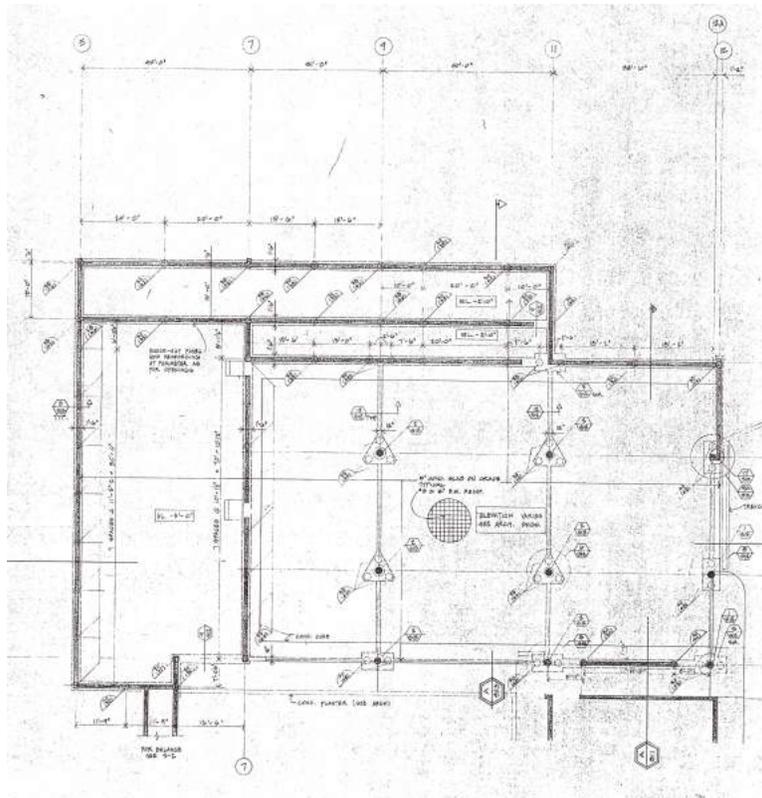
Building 5 & 6 & 7 Typical Ground Floor Plan
